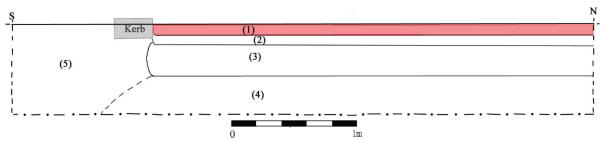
West facing section of N-S oriented trench. Northwest of Marlborough Gate. Scale 1:20
